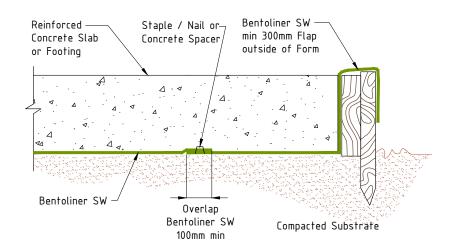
Extra tail of BentoLiner® SW extended out of form and later cut off after concrete pour
